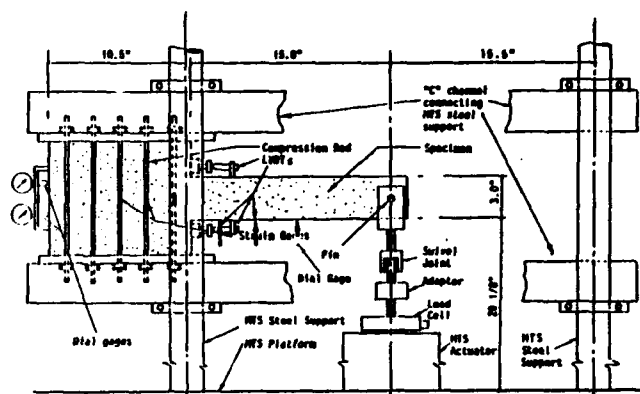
Test Set-up for Reinforced Concrete Specimen (1 in. = 25.4 mm).
